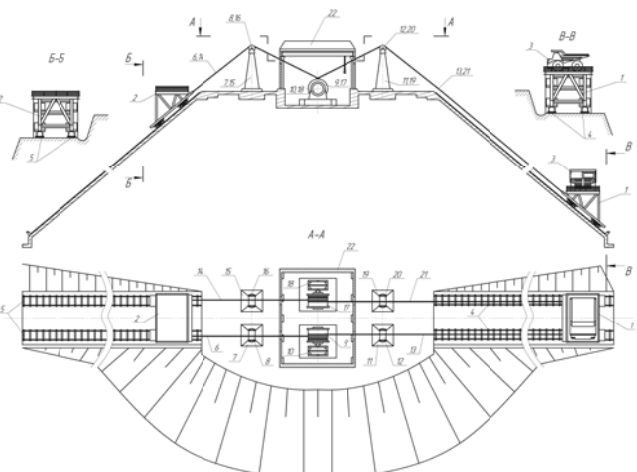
General view of a hoisting plant with an opposite-sided arrangement of two parallel tracks in a vertical plane
